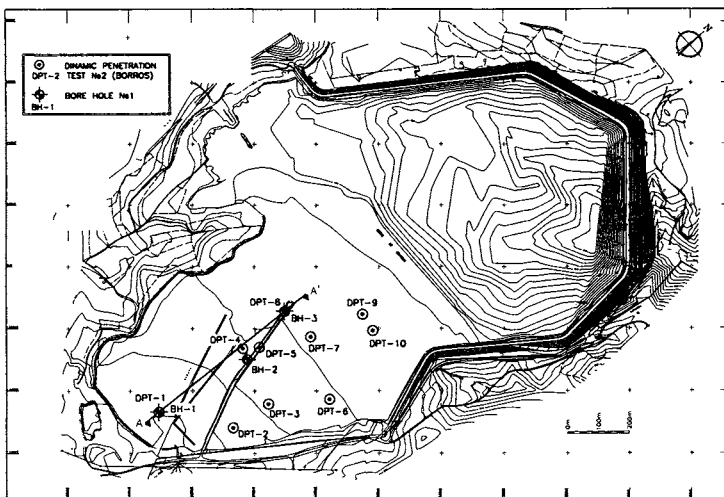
(Courtesy ENDESA) Valdeserrana Dam. Site Plan.
